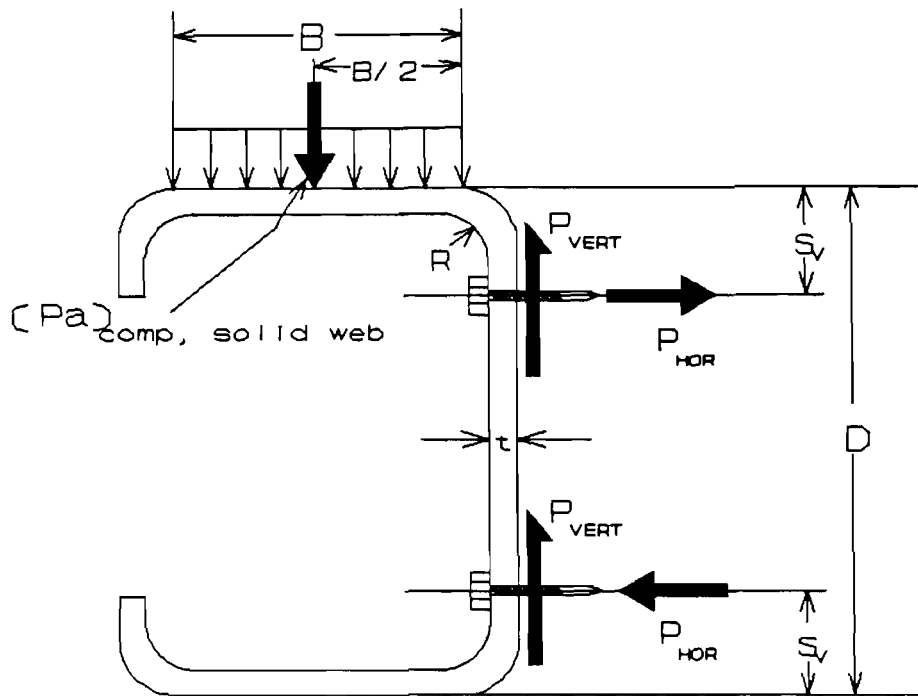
Forces in Screw Connections of Web Reinforcement Configurations
